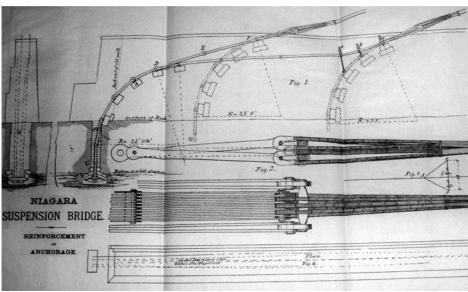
Restoration in 1880 by Leffert L. Buck, showing the new trusswork and the additional anchorage (TR TG 25 N57)
